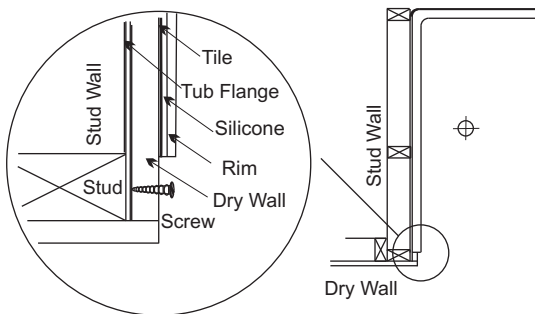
TOP VIEW SHOWING DRY WALL FINISHING
